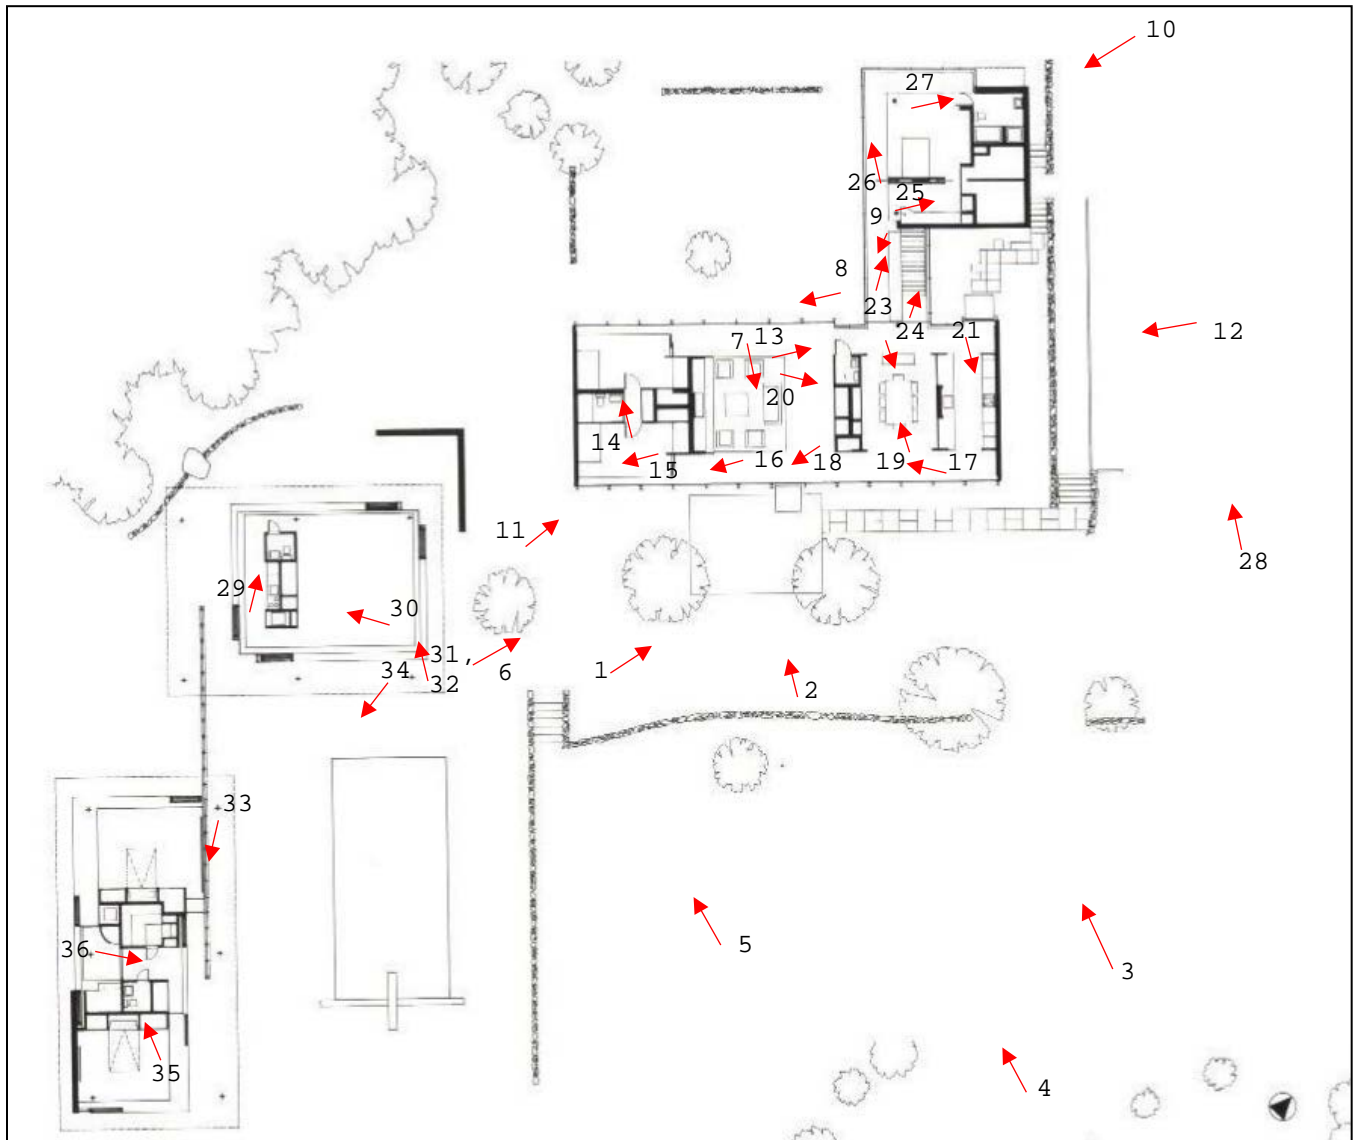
Full Plan of buildings/Photo Key (Source: of plan, Ojeda, Oscar Riera, ed. *The New American House 2: Innovations in Residential Design and Construction, 30 Case Studies*).
